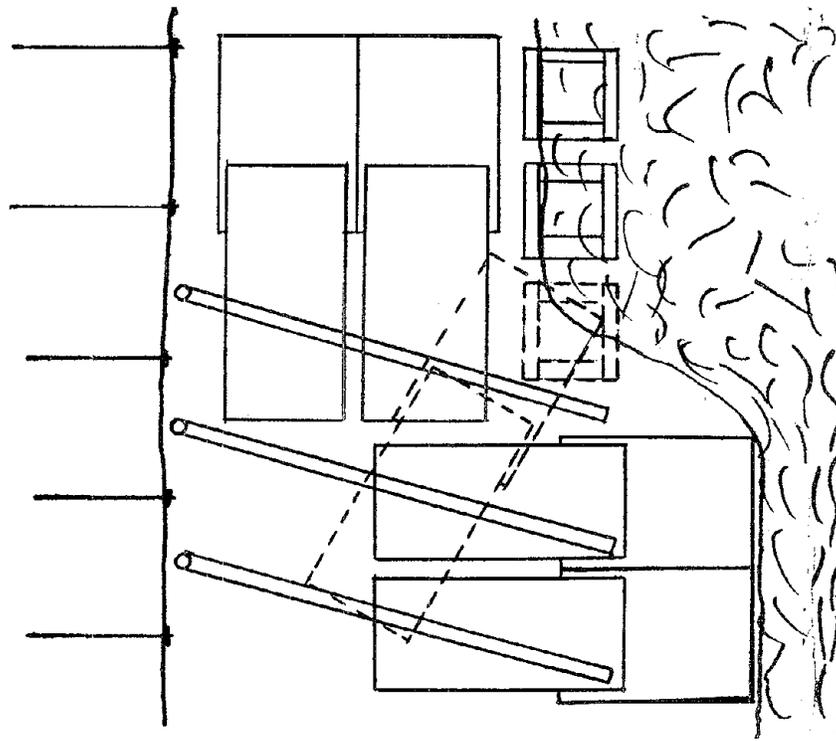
Shield Removal Sequence with Face Props and Beams. As one shield is removed a crib is set.
